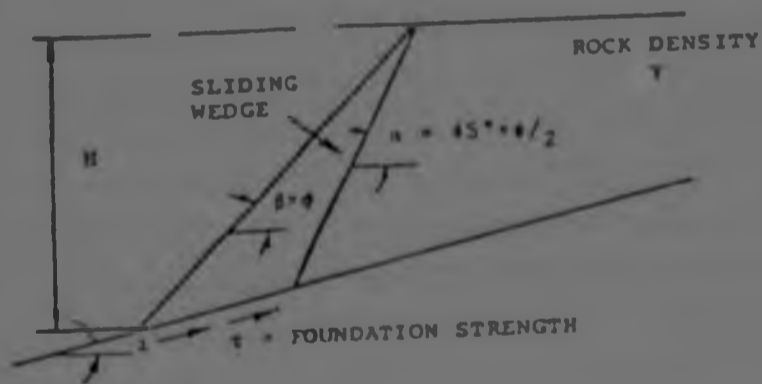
Foundation strength corresponding to failure of dump on shallow cohesive foundation according to sliding wedge analysis⁵.
